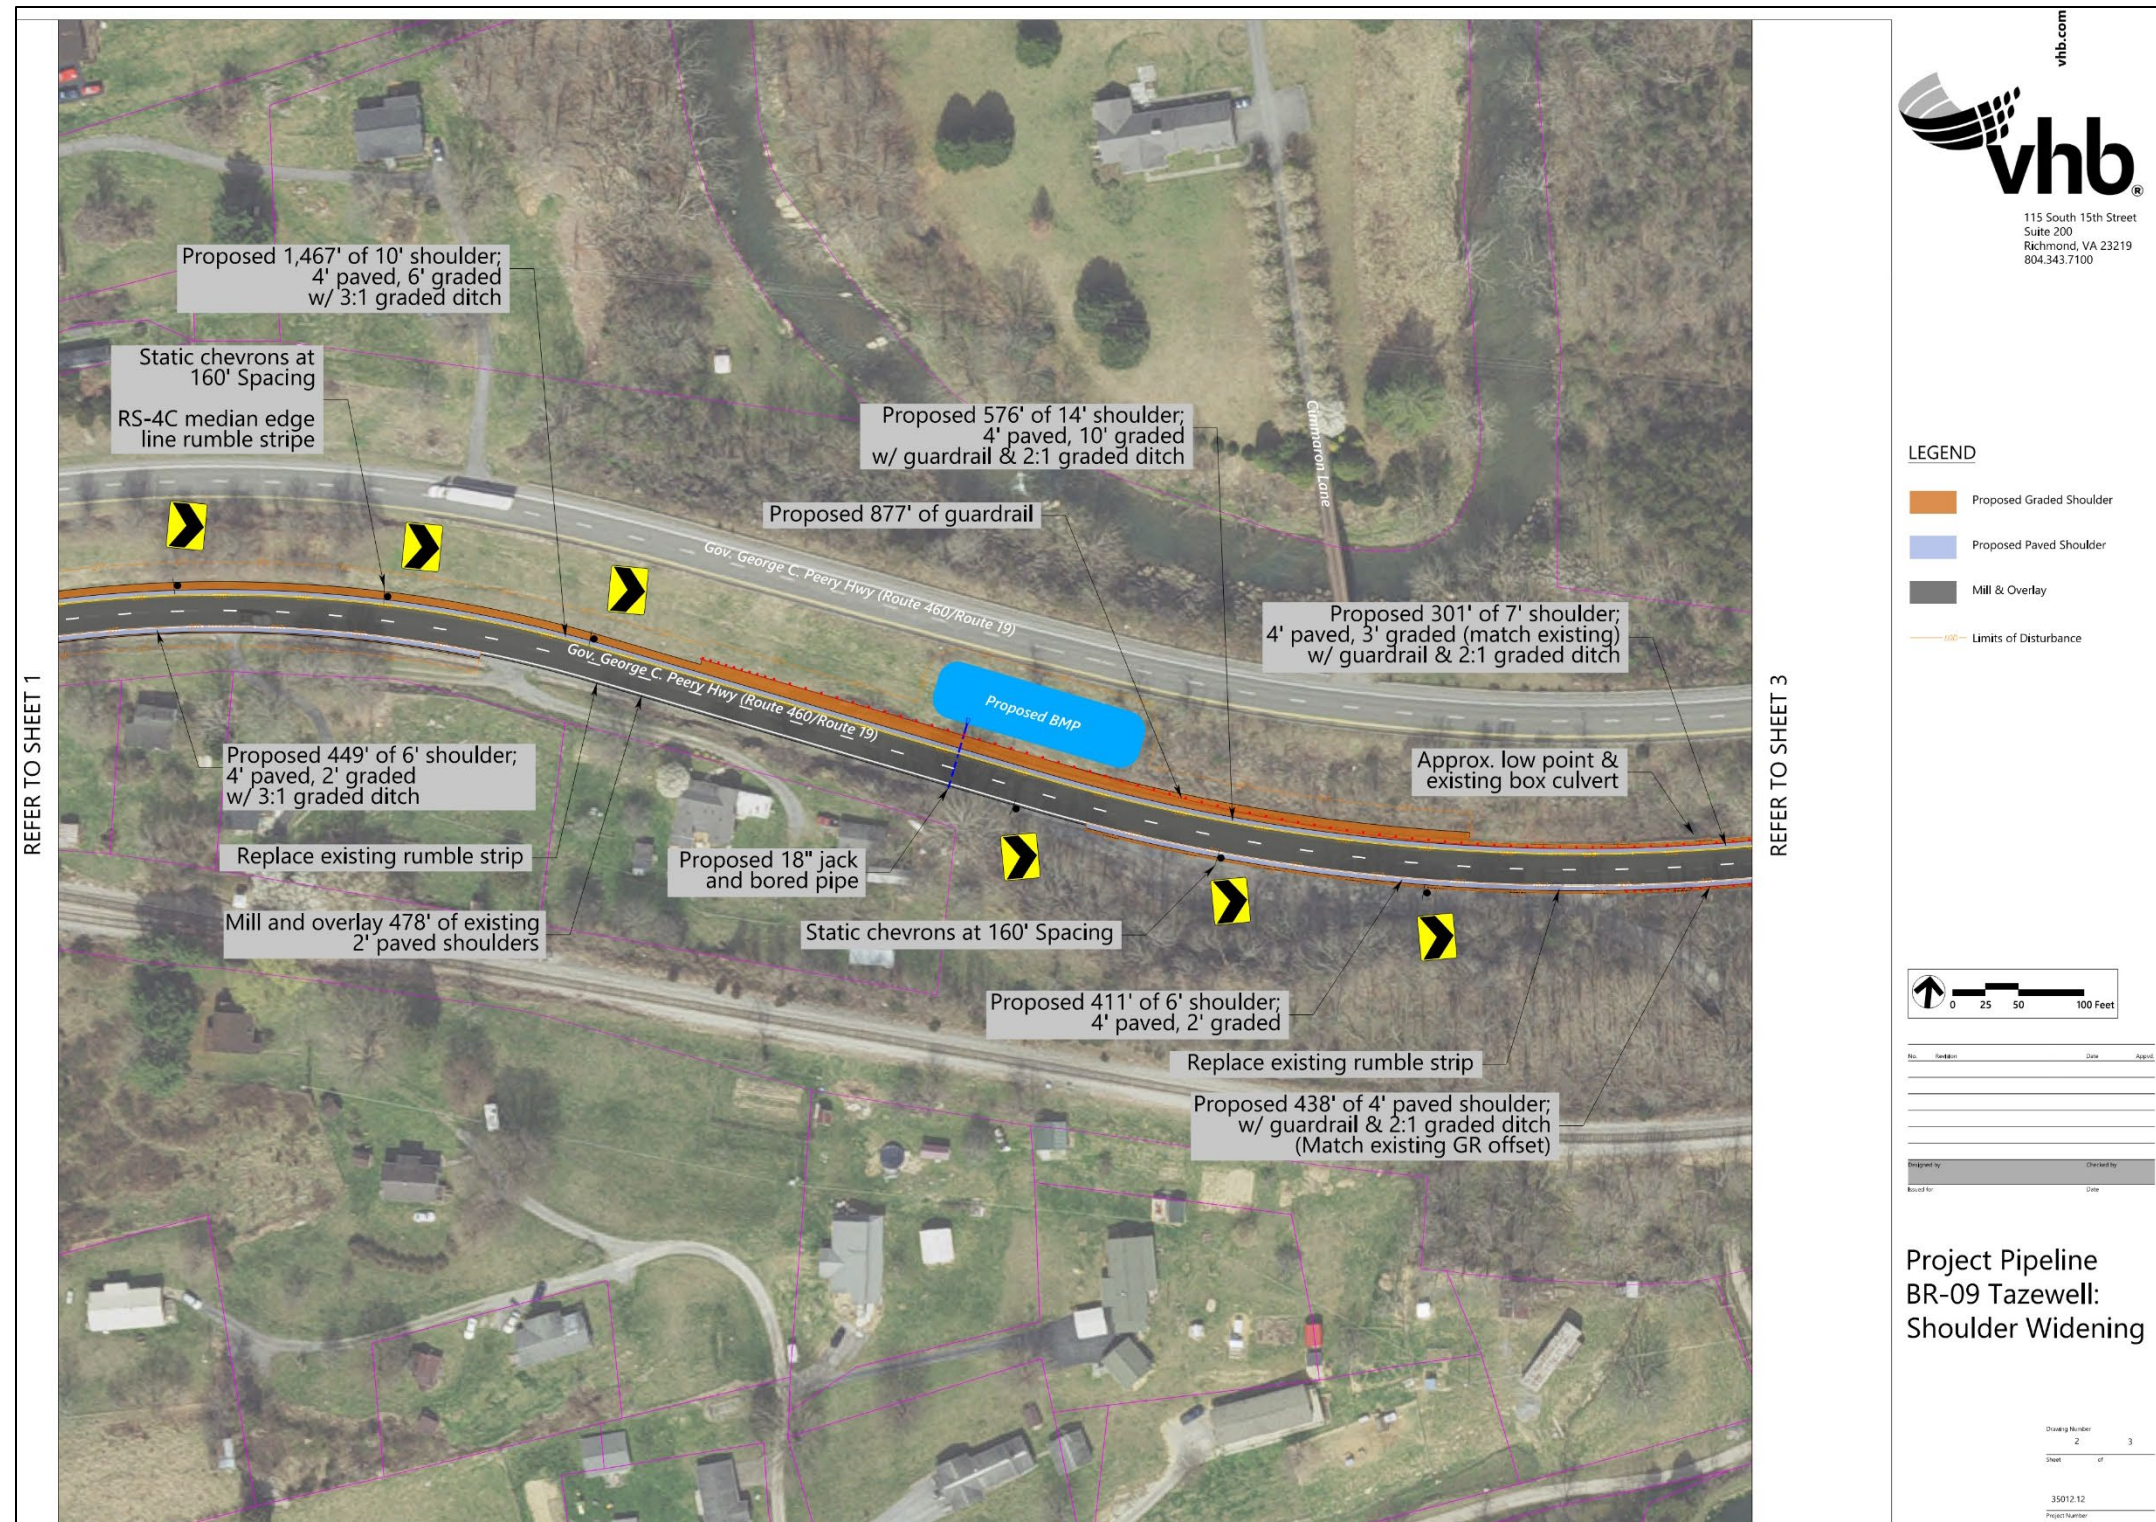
Shoulder Widening and Safety Improvements - Sheet 2
